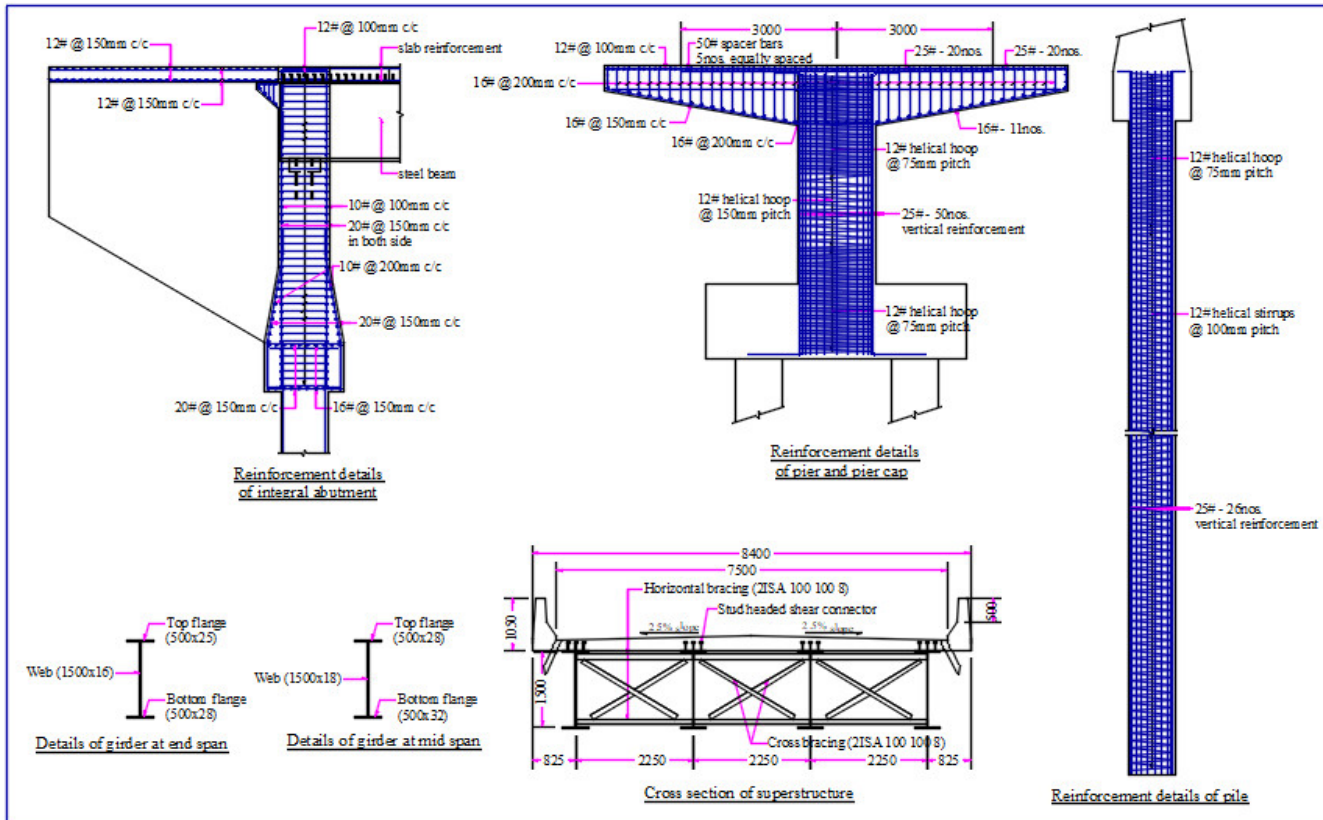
Sectional details of deck and reinforcement detailing of abutment, pier and pile
